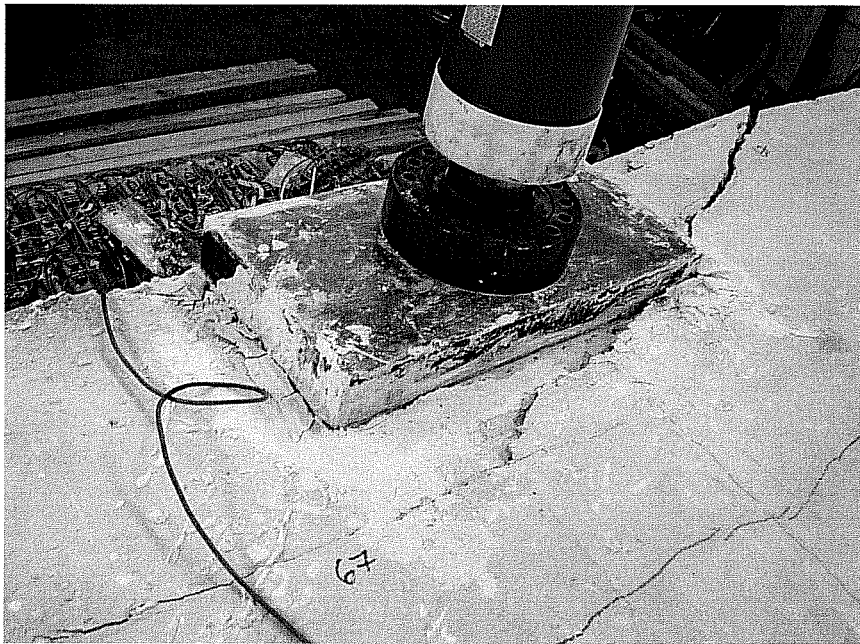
West exterior 10-ft bay failure at top of slab, facing southwest
